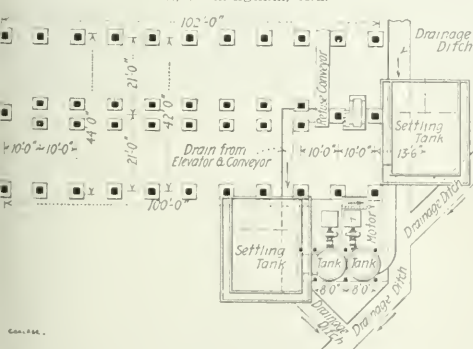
GENERAL FOUNDATION PLAN OF WASHER
